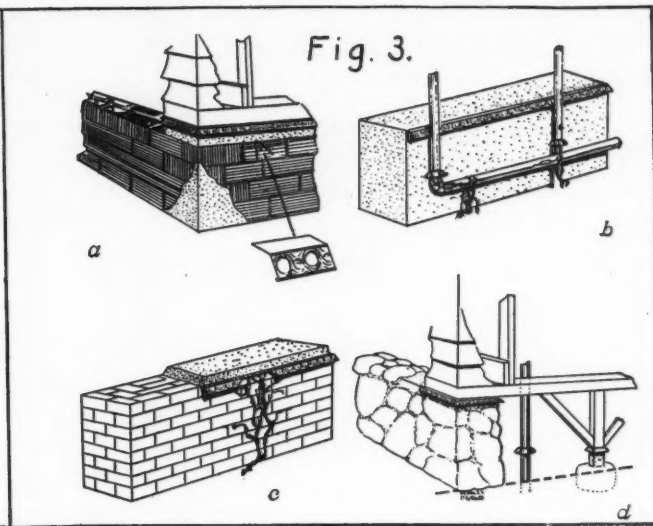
The insulation of hollow and solid masonry foundation units against termites: (a) Foundation wall of hollow tile surfaced with stucco, showing metal termite shield in place and how the top of the wall is capped with sheet slate and concrete; (b) concrete wall with termite shield at top and horizontally laid piping fitted with metal shield above bend to shut off termite tubes; (c) brick wall with termite shield and capped with concrete (Note how the shield mechanically blocks the earth-like shelter tubes of the termites.); (d) stone wall with termite shield and capped with concrete and wooden posts insulated from the ground with base stone and concrete block. Note termite shields on post and piping
